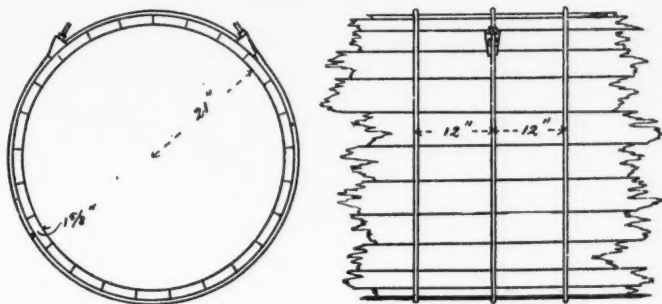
SECTION OF CONDUIT, SHOWING METHOD OF CONSTRUCTION
